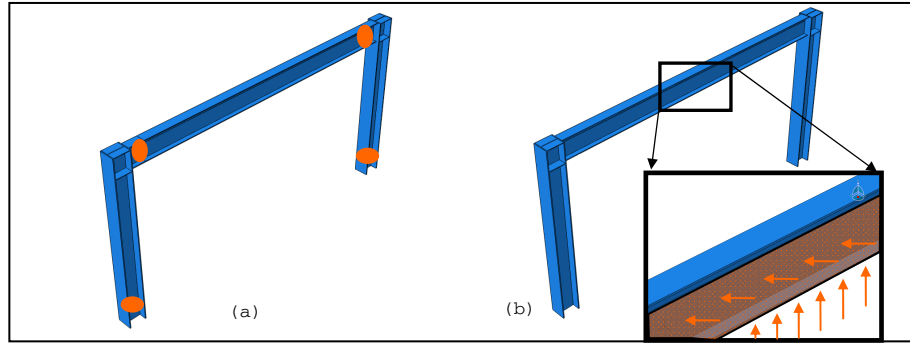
(a) Locations of cracked fire proofing cover where the temperature loading is applied in EFS frames. (b) Beam regions where the temperature loading is applied in uncovered frames.
